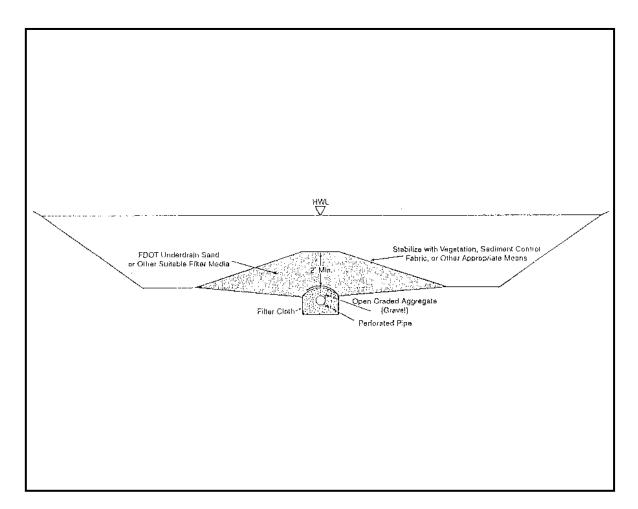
Typical Cross-Section of Elevated Sand Filter for Stormwater Treatment Used in Conjunction with Dry Detention Facility
